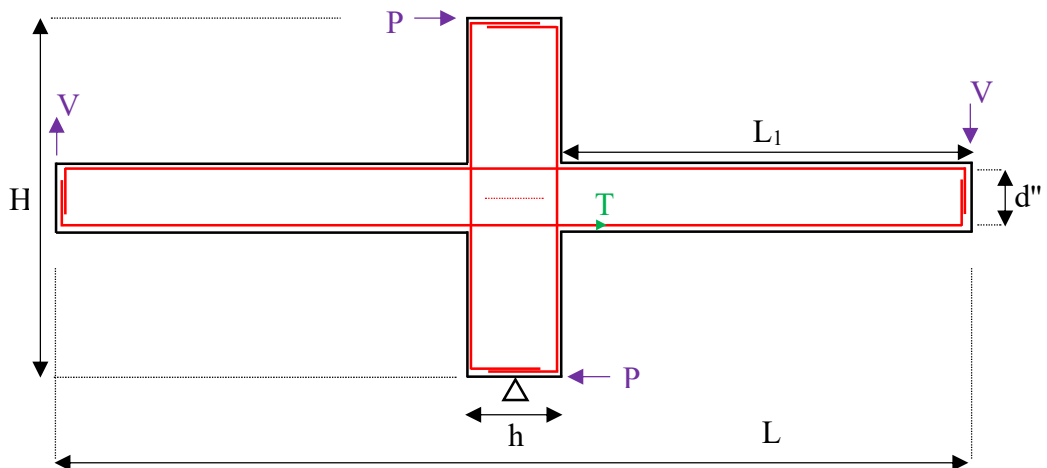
Interior beam-to-column connection loaded at the column top.
